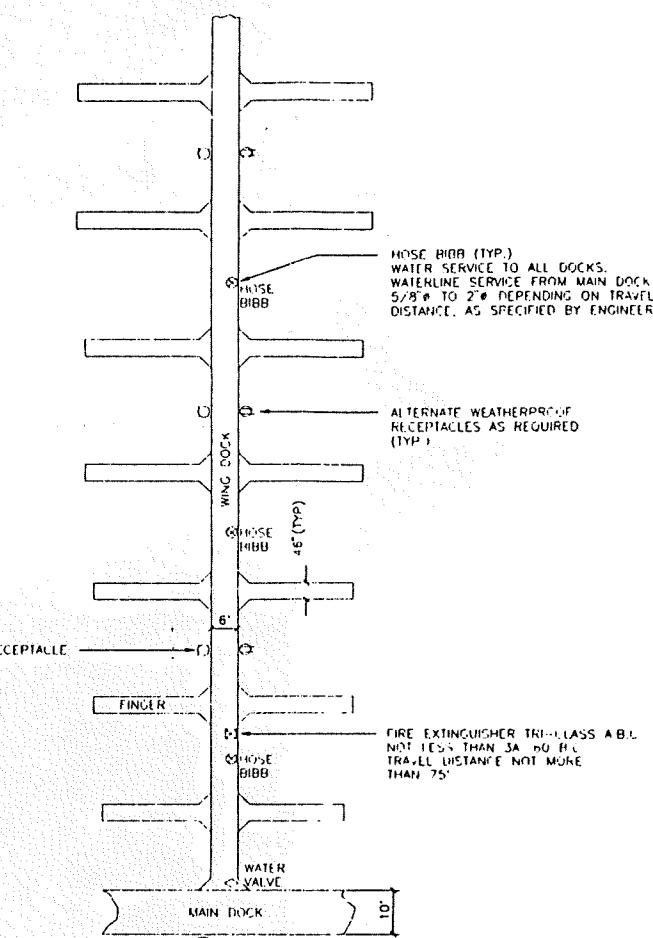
DETAIL - ELECTRICAL OUTLETS & LIGHTING
